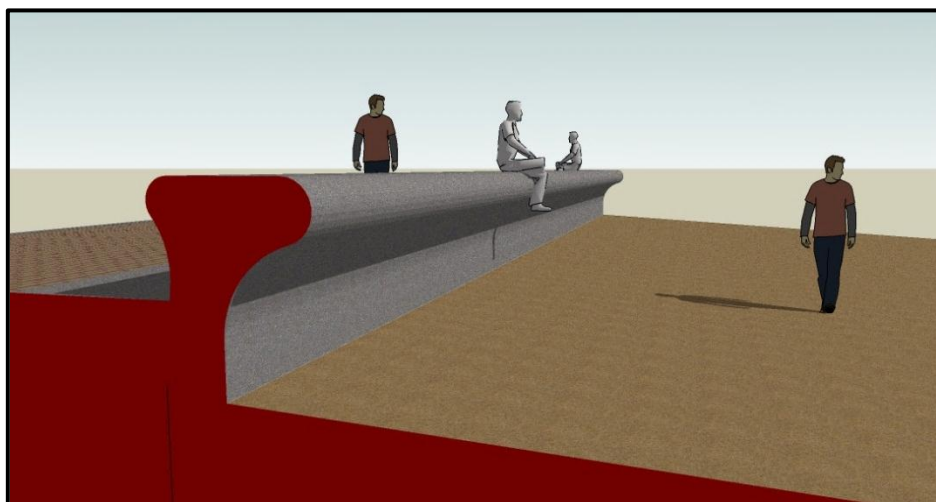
Artist's impression of the proposed recurve wall along the Strand
